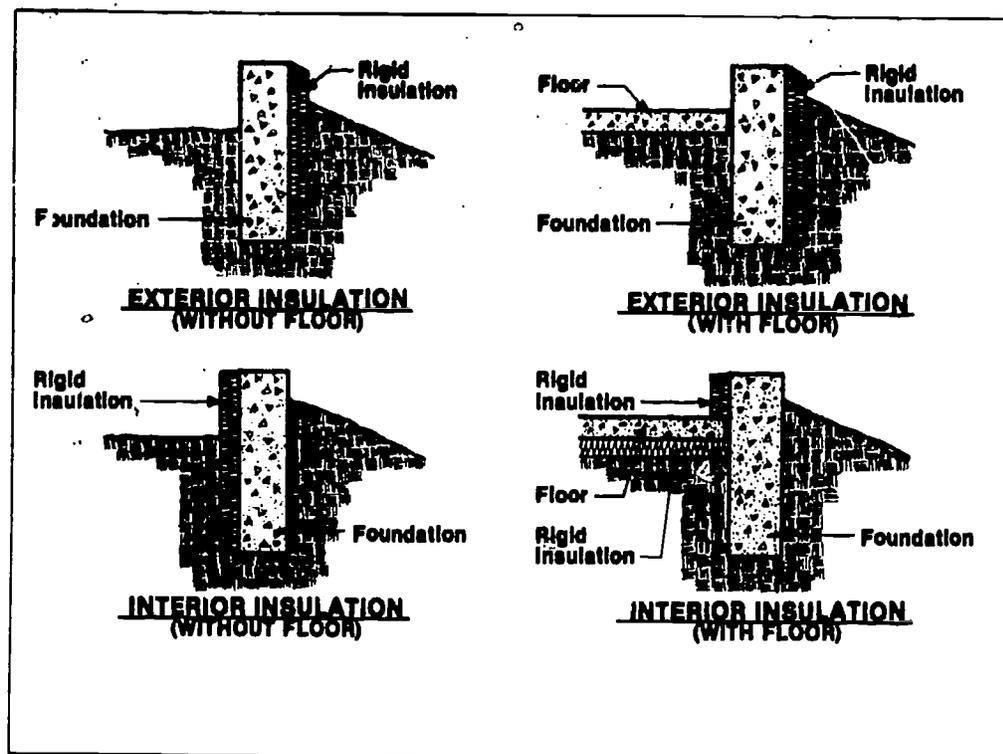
The foundations of greenhouses and sunspaces in northern climates should be well insulated. This can allow the interior floor of the greenhouse to serve as thermal storage.
